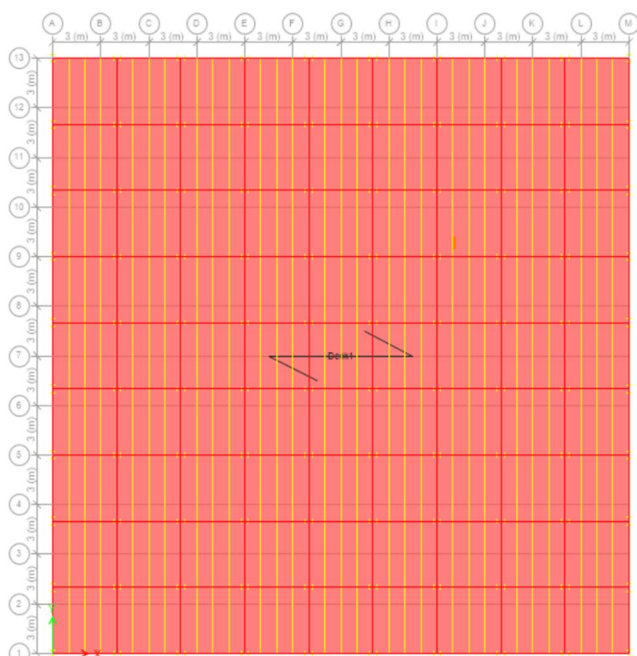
Typical Floor Plan Steel Structure with X-Bracings
